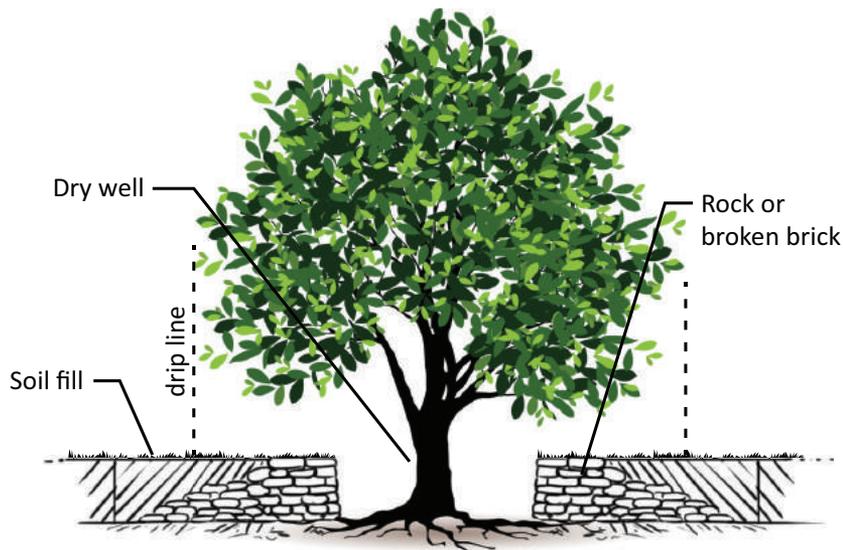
Section of a dry well constructed to protect existing tree on site
